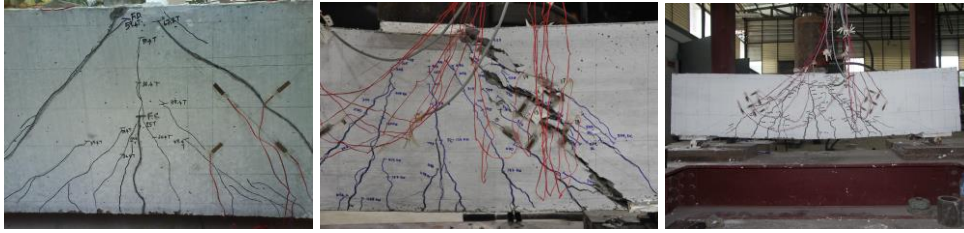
(a) Typical failure of specimen series A; (b) Typical failure of specimen series B; (c) Typical failure of specimen series C.
